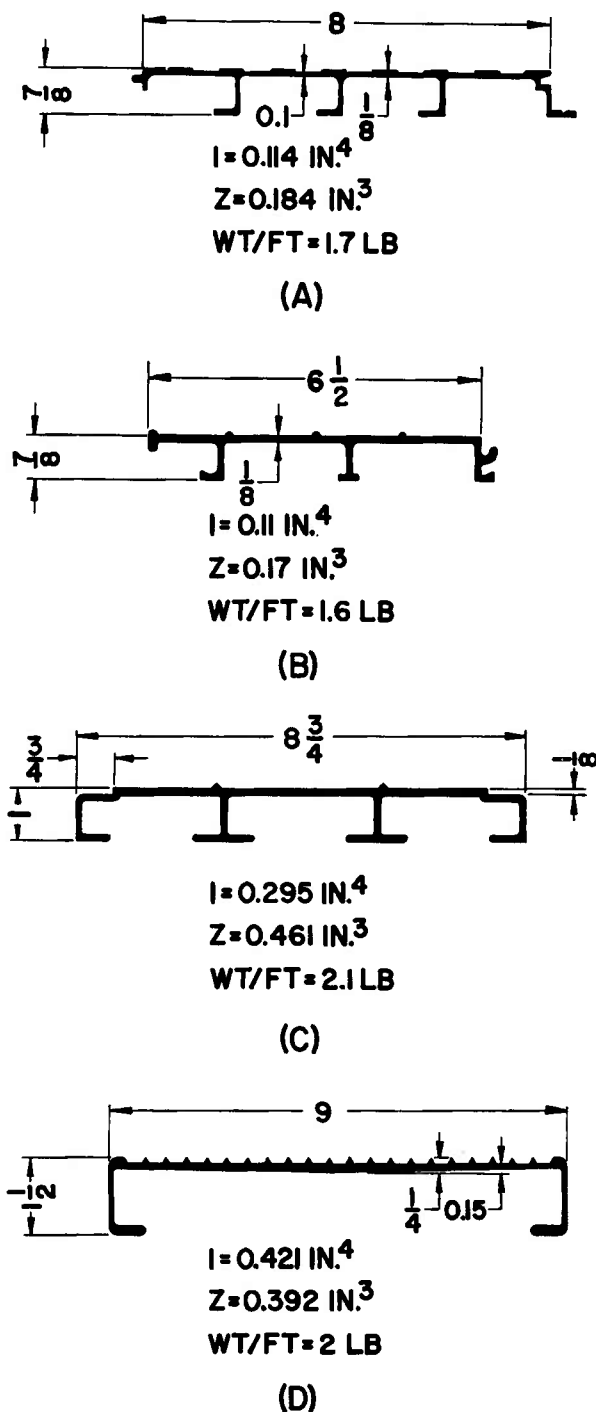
Typical Aluminum Flat-top Plank Flooring<sup>73</sup>
